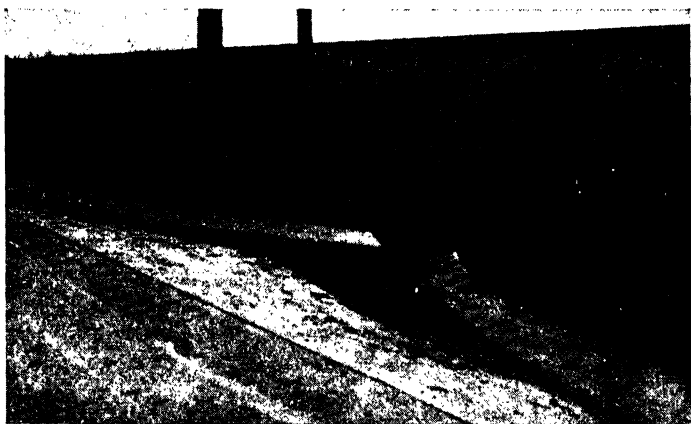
Offtake from shallow V-gutter. Note the silt due to poor outlet ditch.
